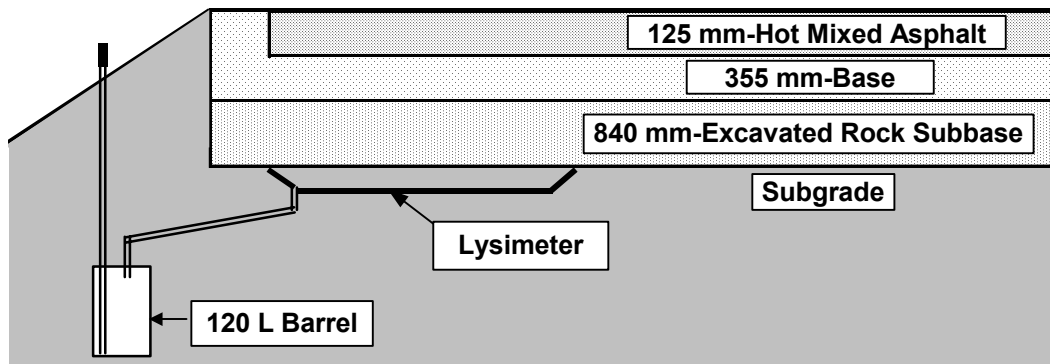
Layout of Lysimeters at STH 60 Site.
